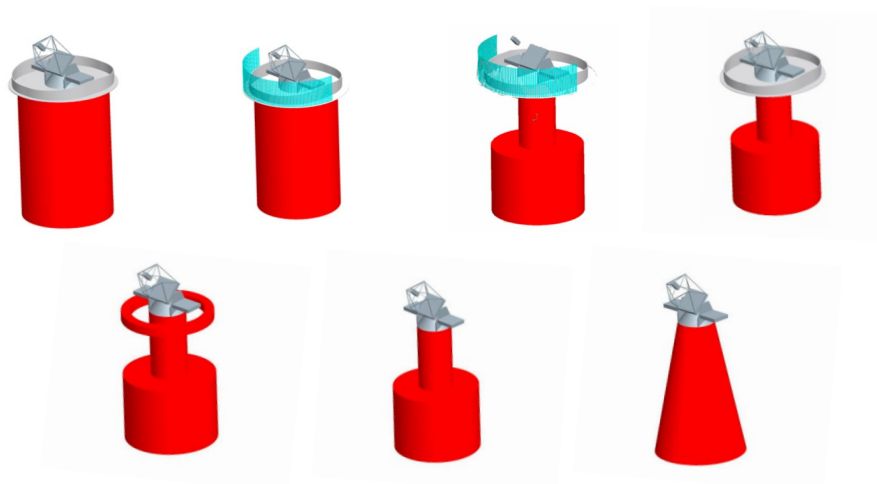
Investigated pier models. From left to right, top to bottom: Large cylindrical pier (Model 3); Large cylindrical pier with wind shield (Model 4); Small cylindrical pier with wind shield (Model 11n); Small cylindrical pier (Model 14); Small cylindrical pier with open floor (Model 18); Small cylindrical pier without platform (Model 19); Cone shaped pier (Model 20).
